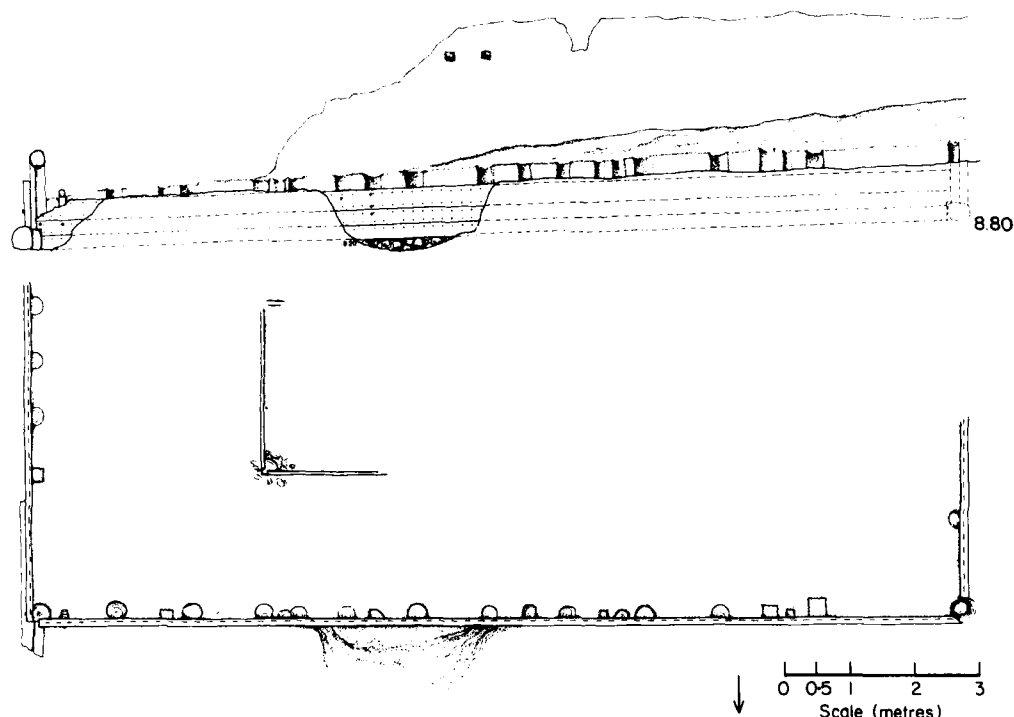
Plan and elevation of Area K-2 block (Agnew).
